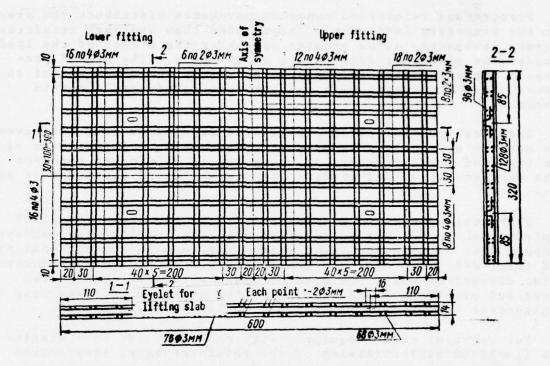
Airport slab P-WX with double-axle, double-layered, stressed reinforcement.
